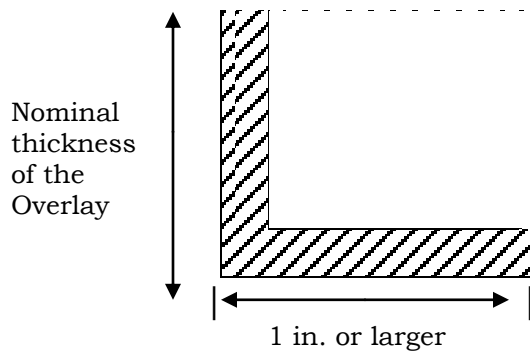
Typical Cross Section Of Frame (angle iron)
